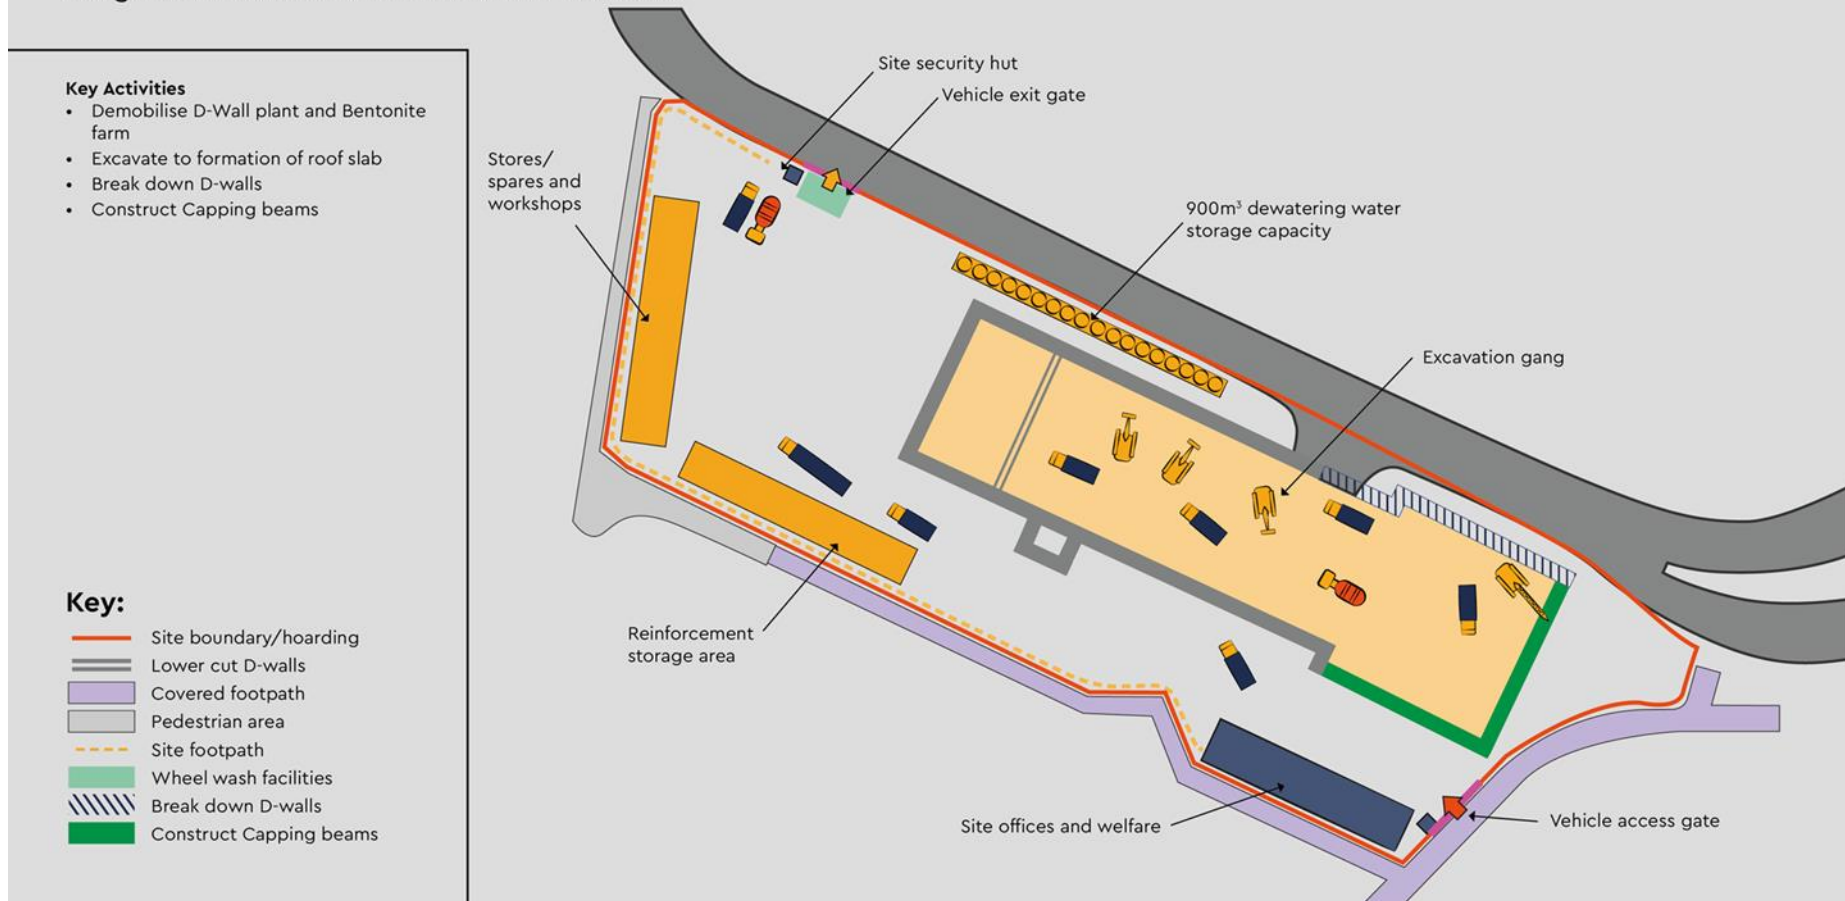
Dublin Airport Station Stage 3 - Excavate to Formation of Roof Slab
